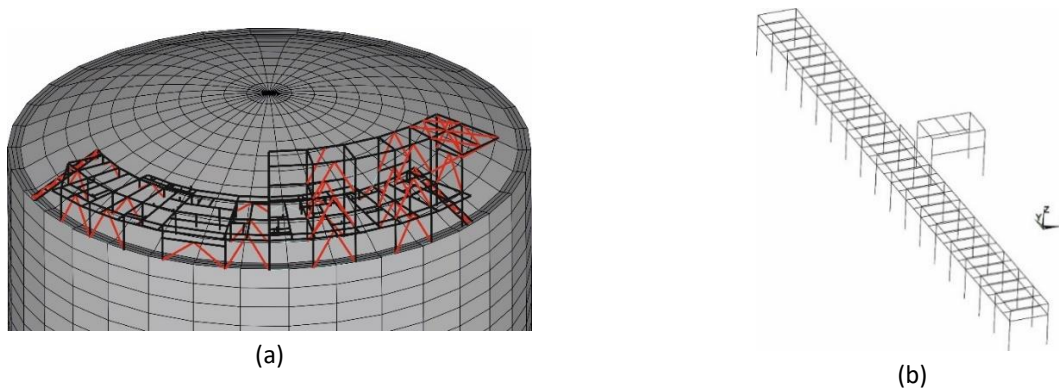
ANSYS FE model: (a) steel platform; (b) concrete support structure.
